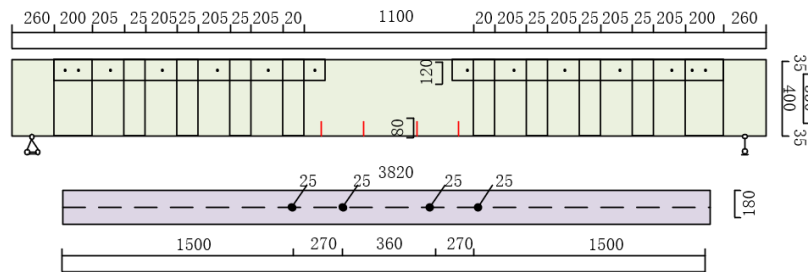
Reinforced concrete bridge specimens model 1 and model 2
